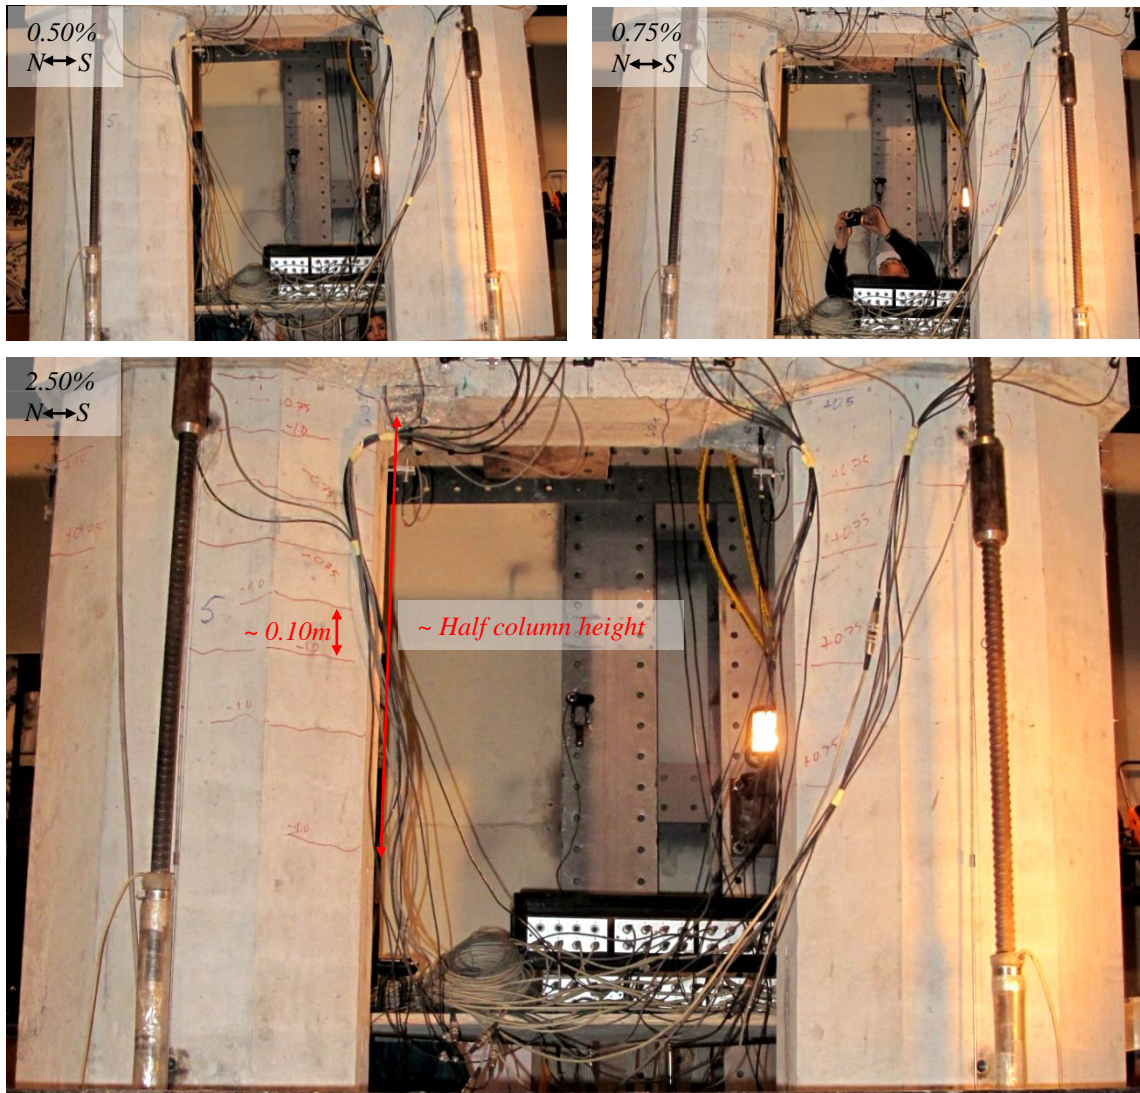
SP_M01 Column cracking patterns
